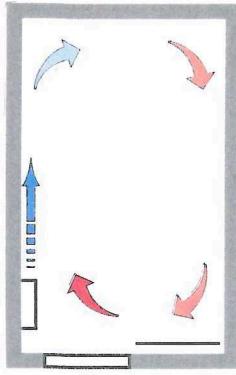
A front wall, ceiling mounted, built-in diffuser.
